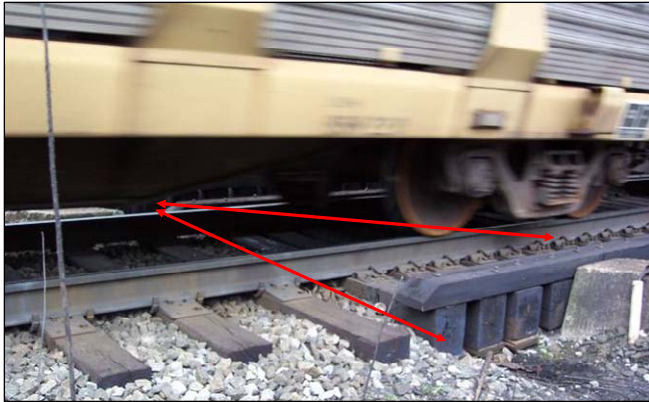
Ties Shimmed and Supported without Ballast, due to Skewed Abutment
